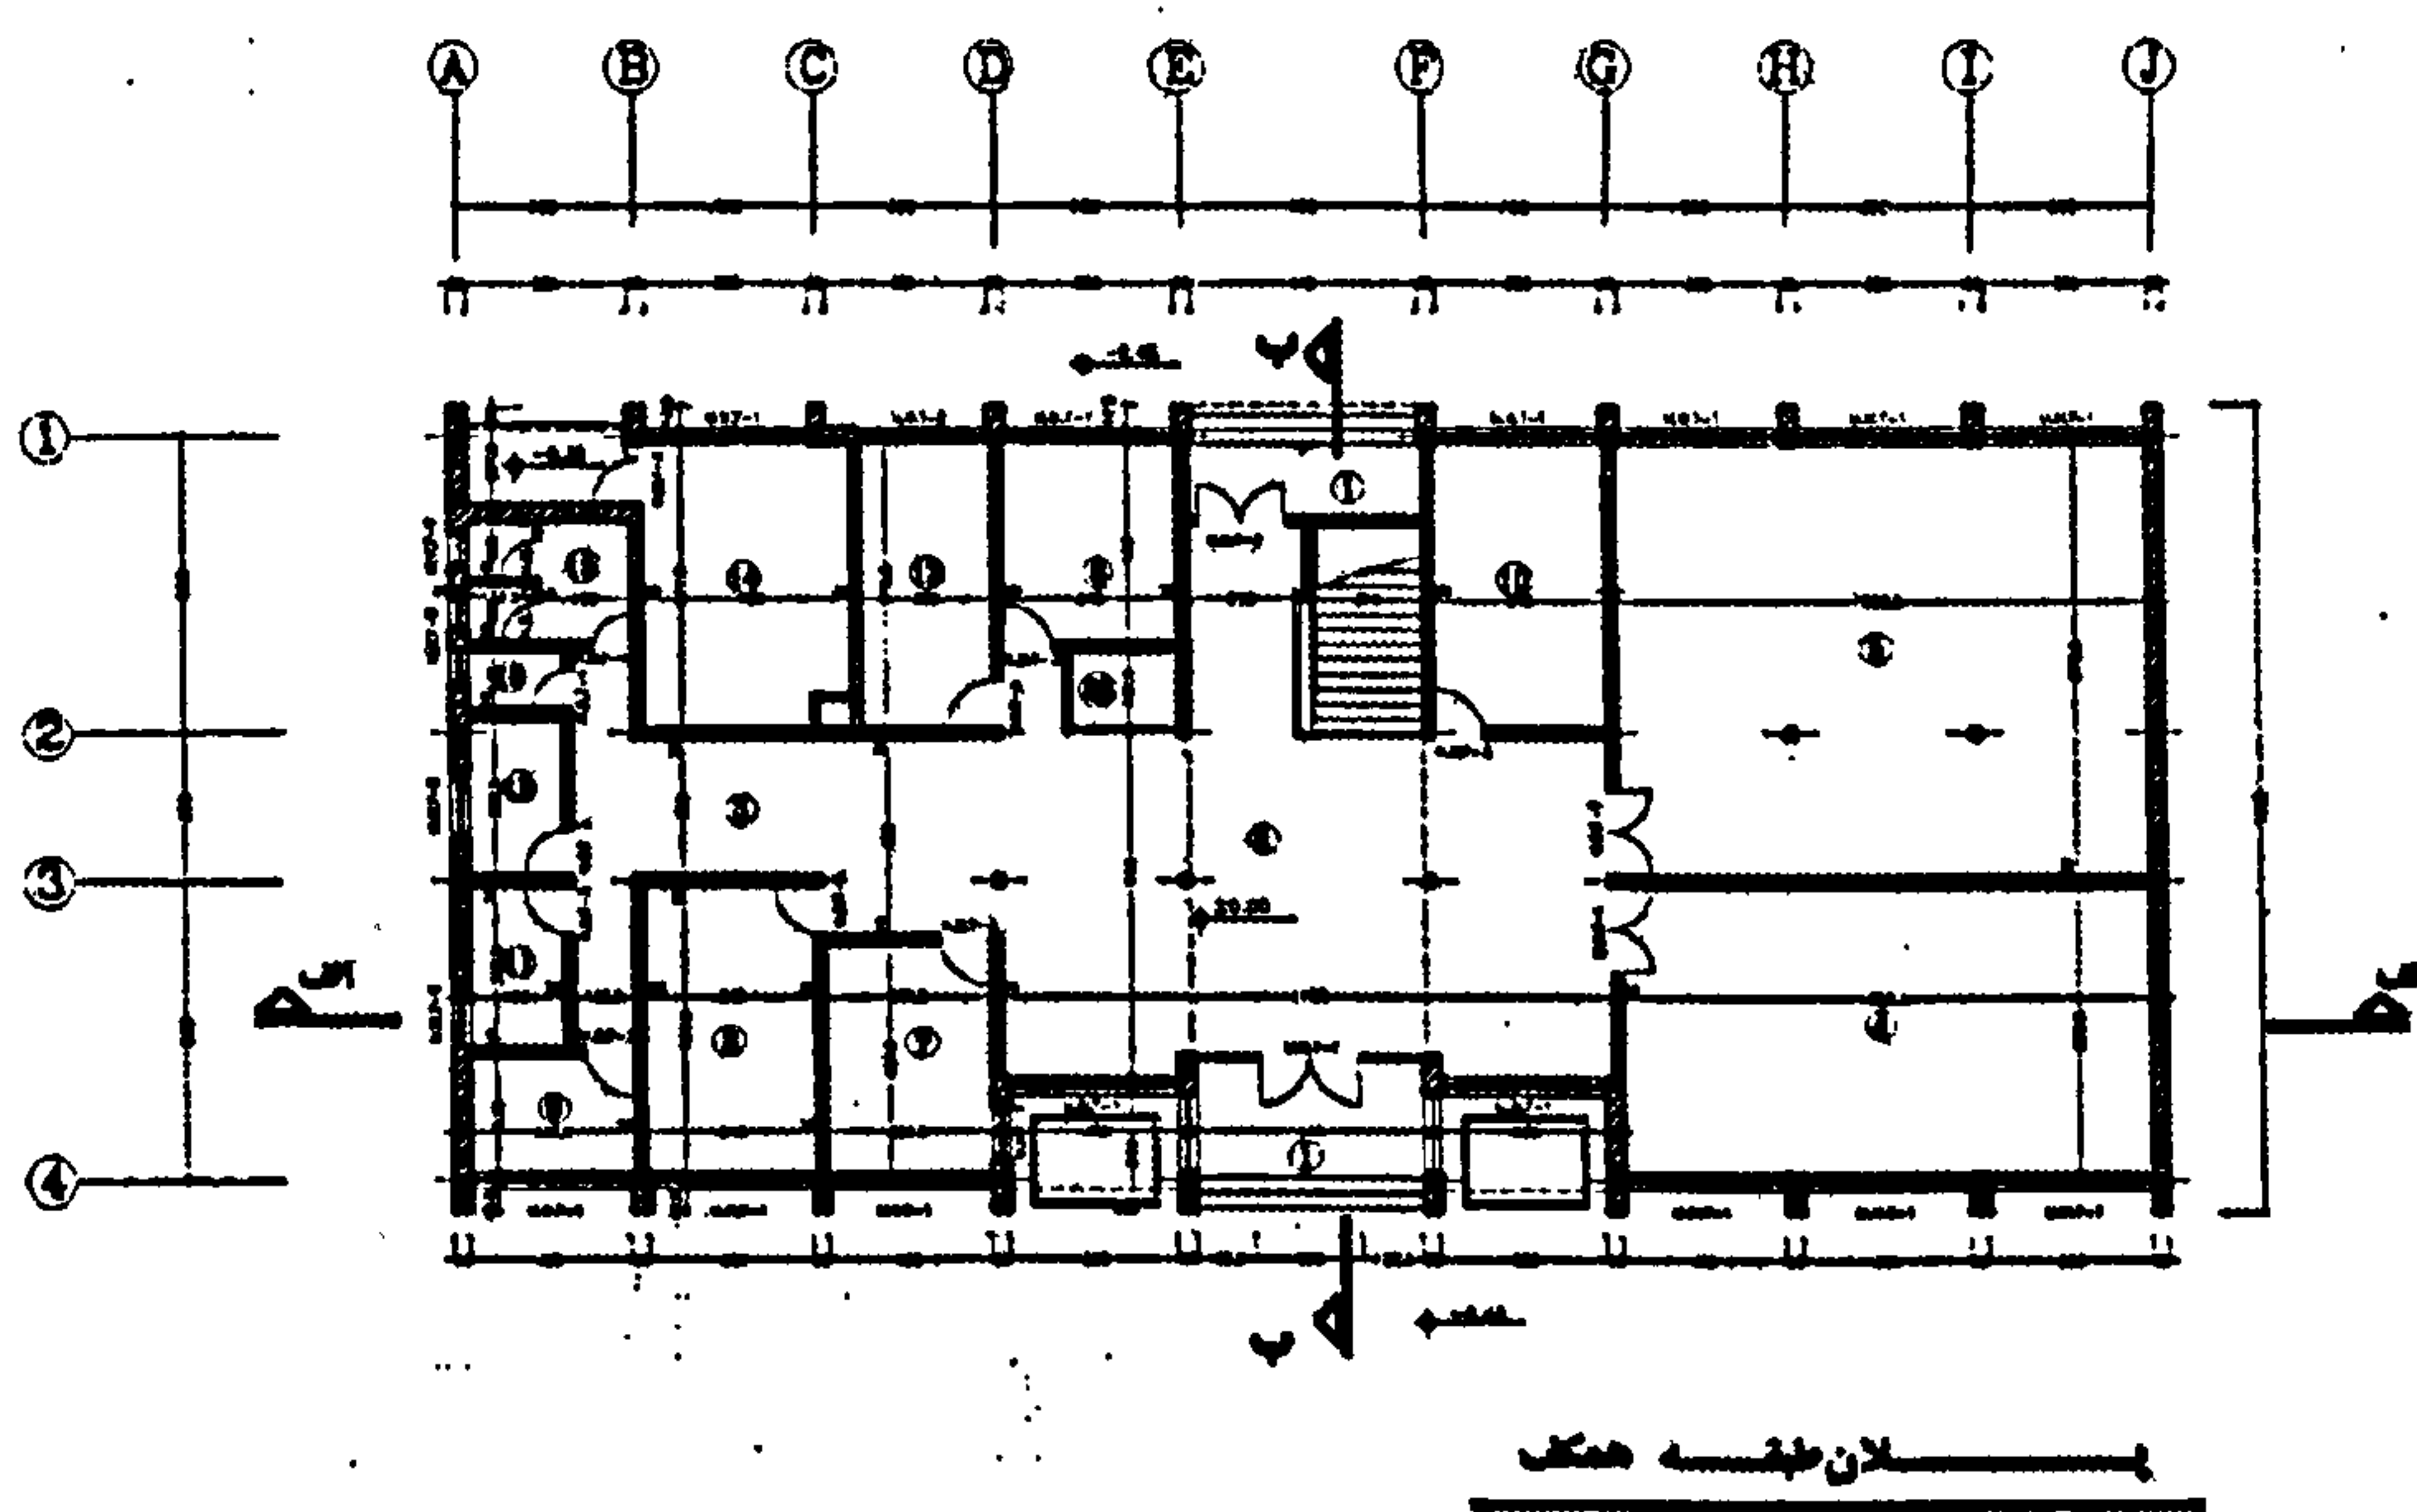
The plan of the first floor of a high school with 9 classrooms (Number 11)
